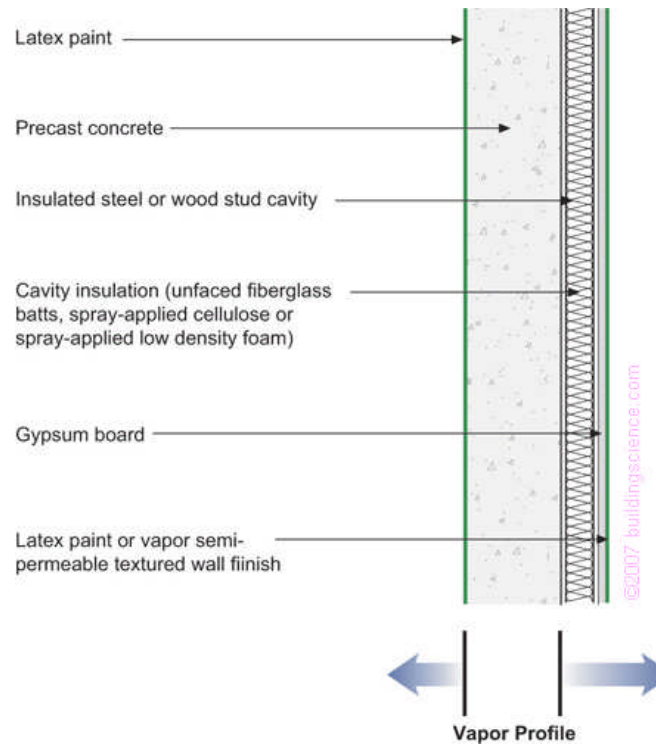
Precast Concrete With Interior Frame Wall Cavity Insulation
